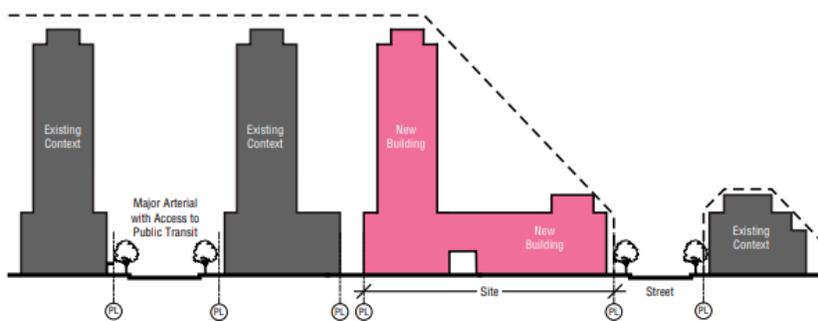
A conceptual illustration of an angular plane and direct relationship in base building height and form to support tall building transition down to a lower-scale area.
